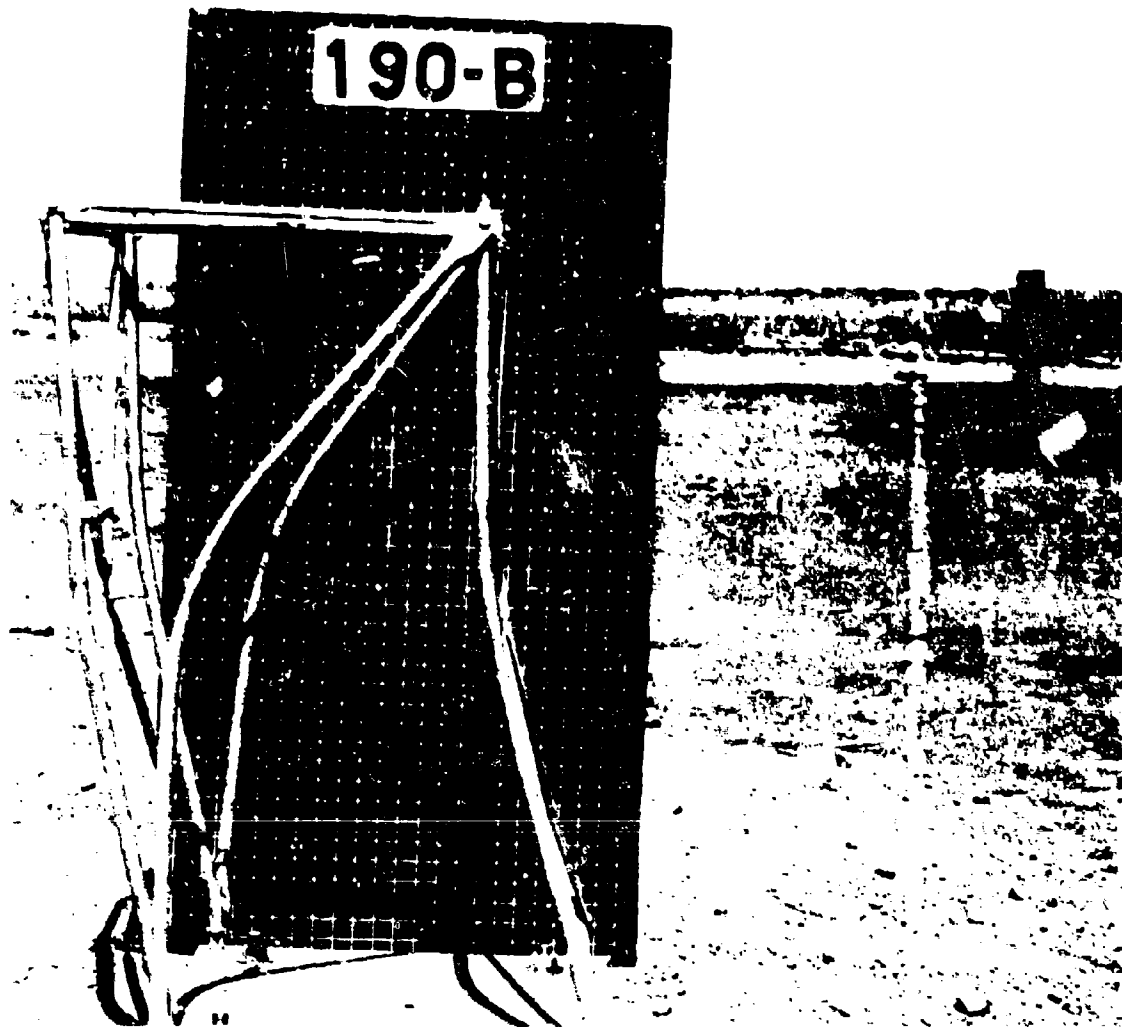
Posttest Photo, U.S. Army Corps of Engineers Structure
